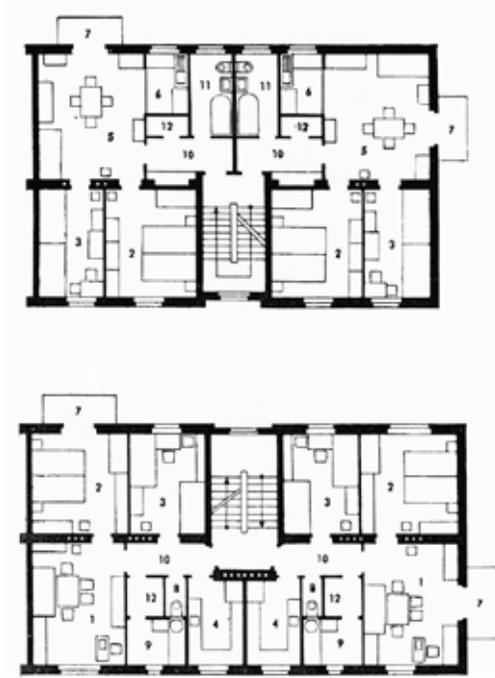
Floor Plan types of *Per-Albin-Hansson Reihenhäuser* (Förster, 1978)
